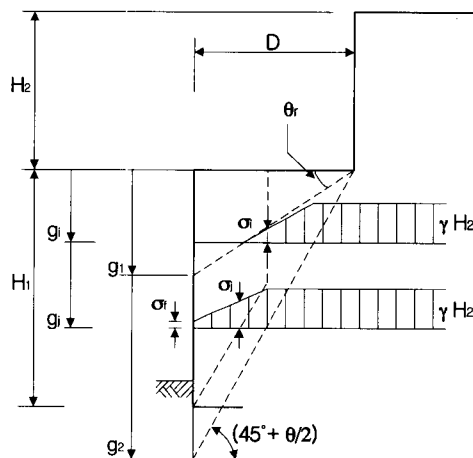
Calculation model for vertical stress increase due to upper wall (FHWA)
